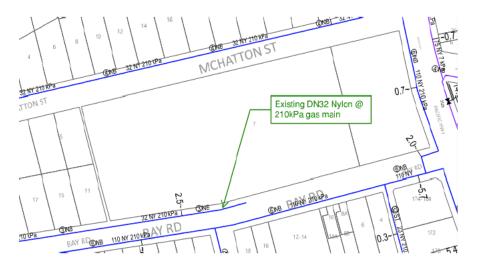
Extract Jemena DBYD plan (Source: LCI)
